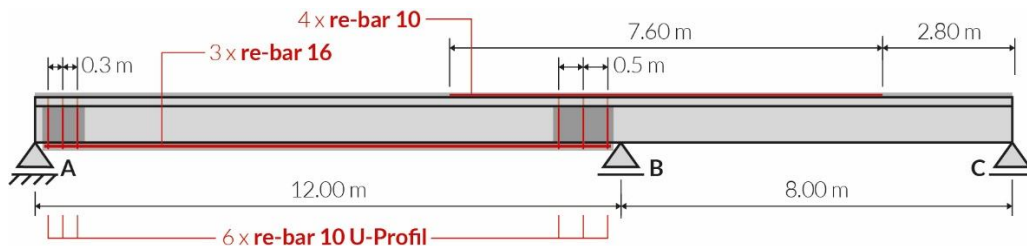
Sketch of strengthening works with re-bar longitudinal reinforcement and re-bar shear stirrups
